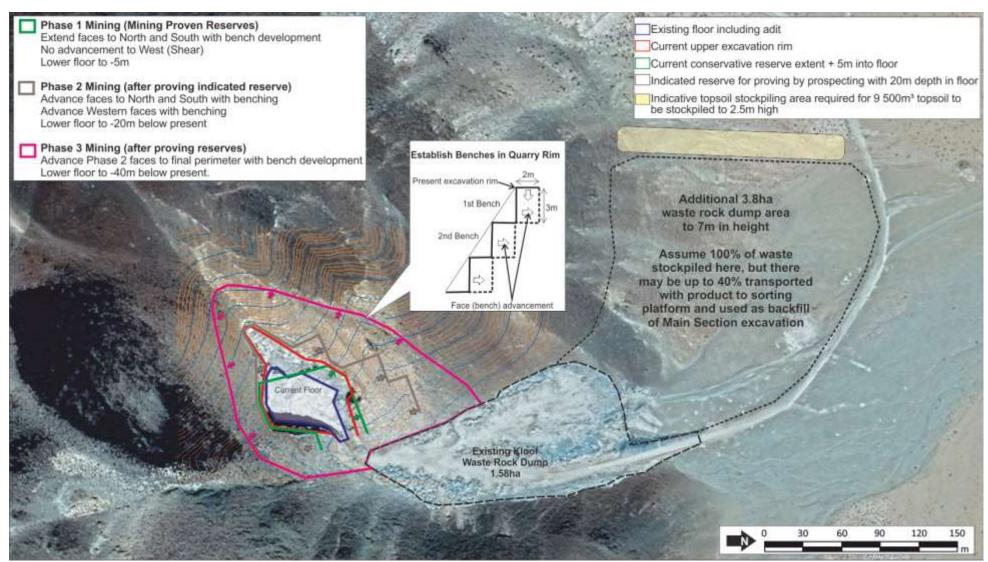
Kloof Section (Provisional Mine Plan subject to further exploration)
